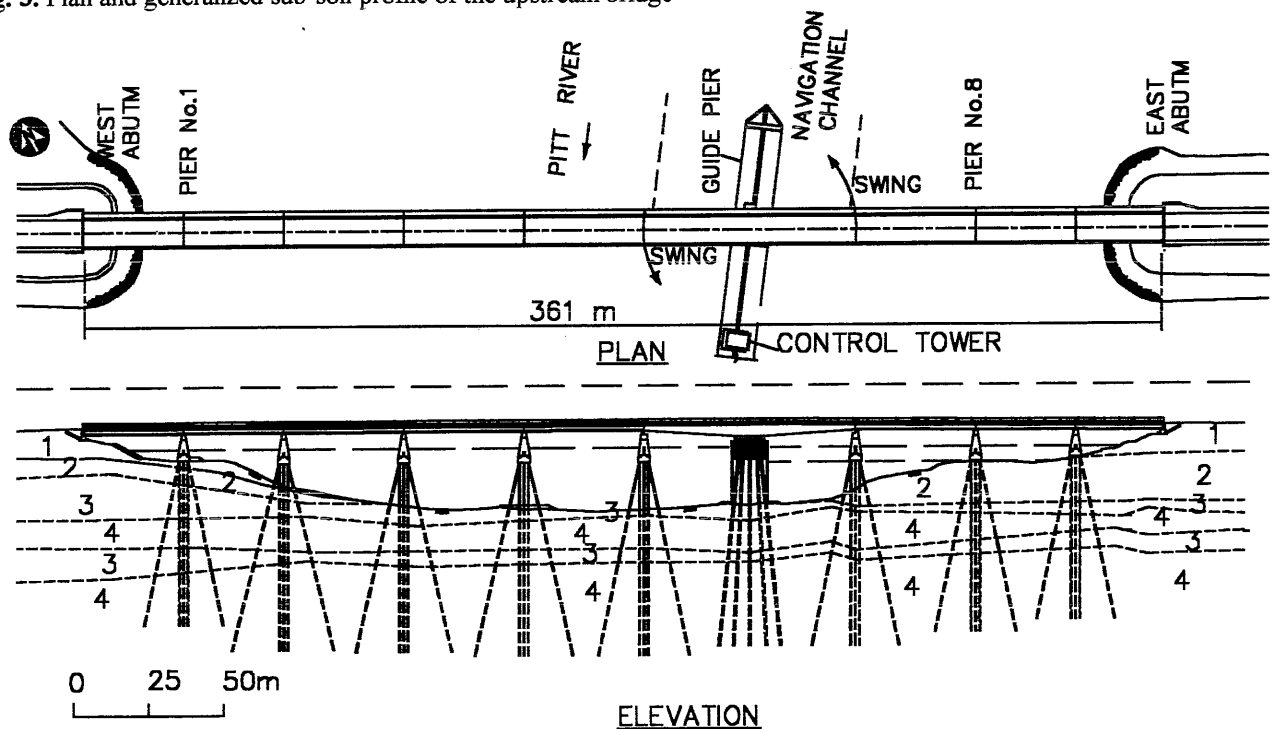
Plan and generalized sub-soil profile of the upstream bridge
